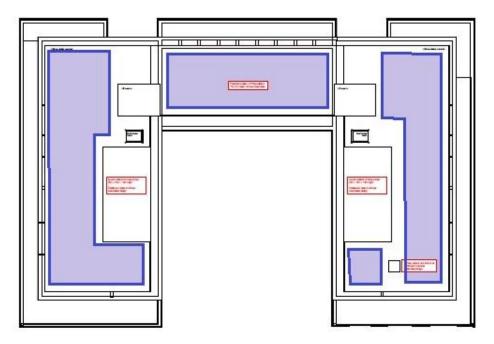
Indicative PV panels layout on flat roofs (based on drawing by Barton Willmore)
